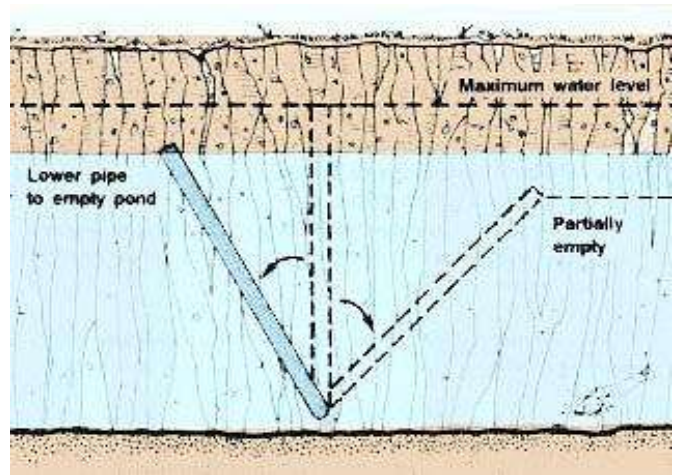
An example of a rotating pipe within pond to control outlet pond elevation within the pond (FAO 2020).
